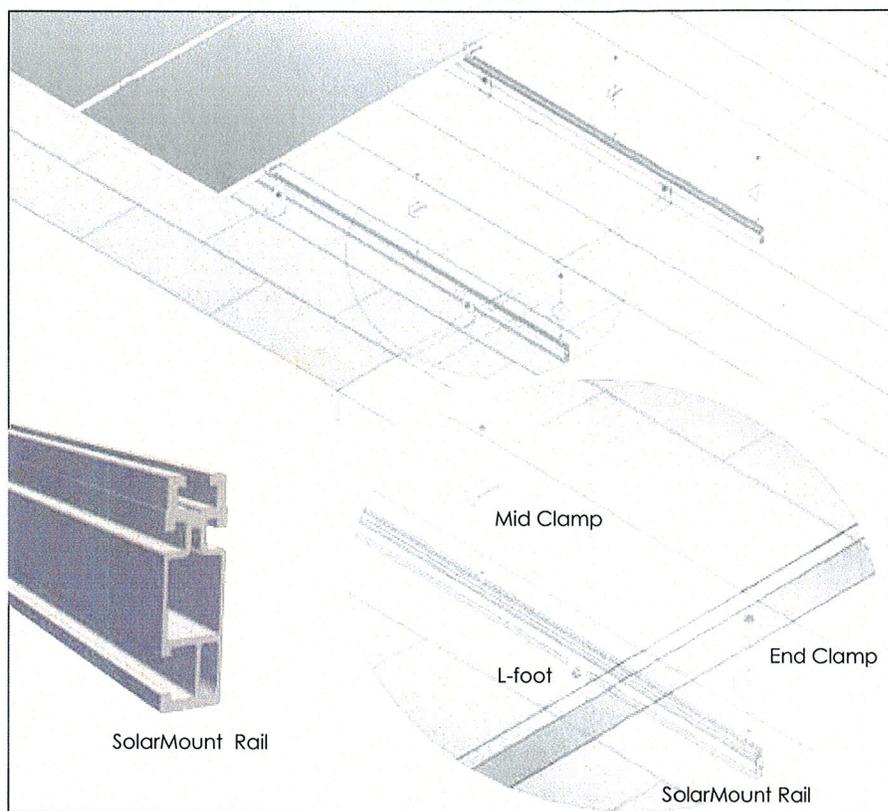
Exploded view of a flushmount installation mounted with L-feet.
